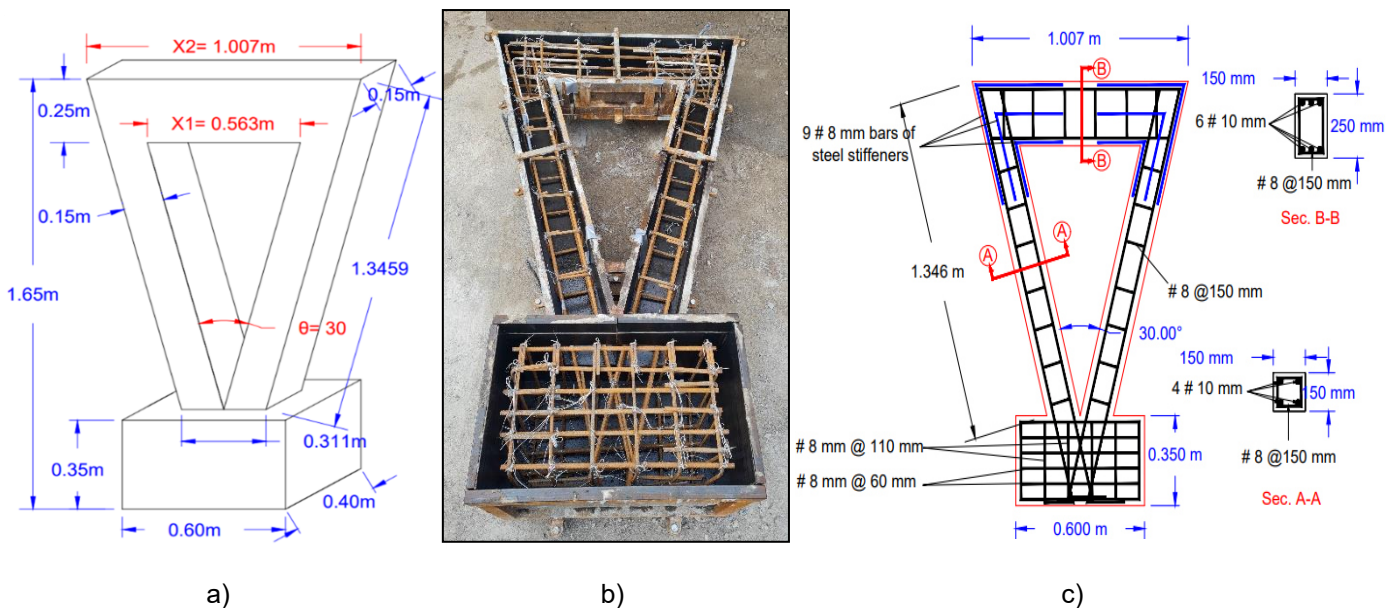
a) Configurations of V-shaped column with tie beam, b) Casting mold and c) Reinforcement details.
